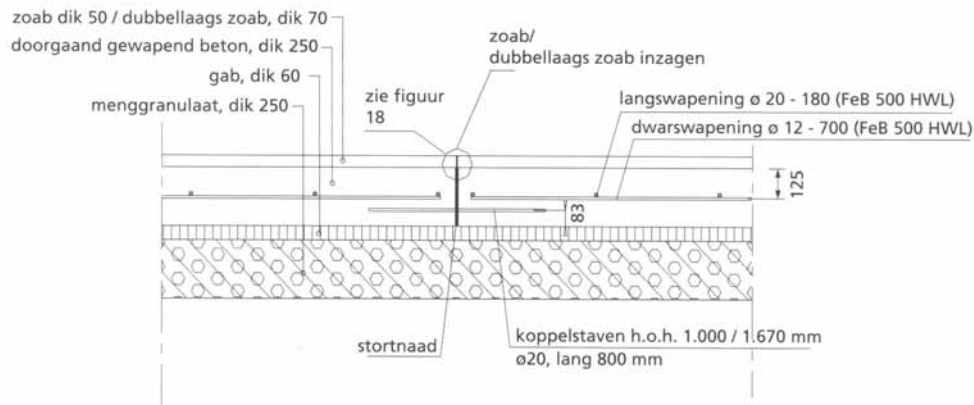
Longitudinal construction joint in reinforced concrete pavement (8).
